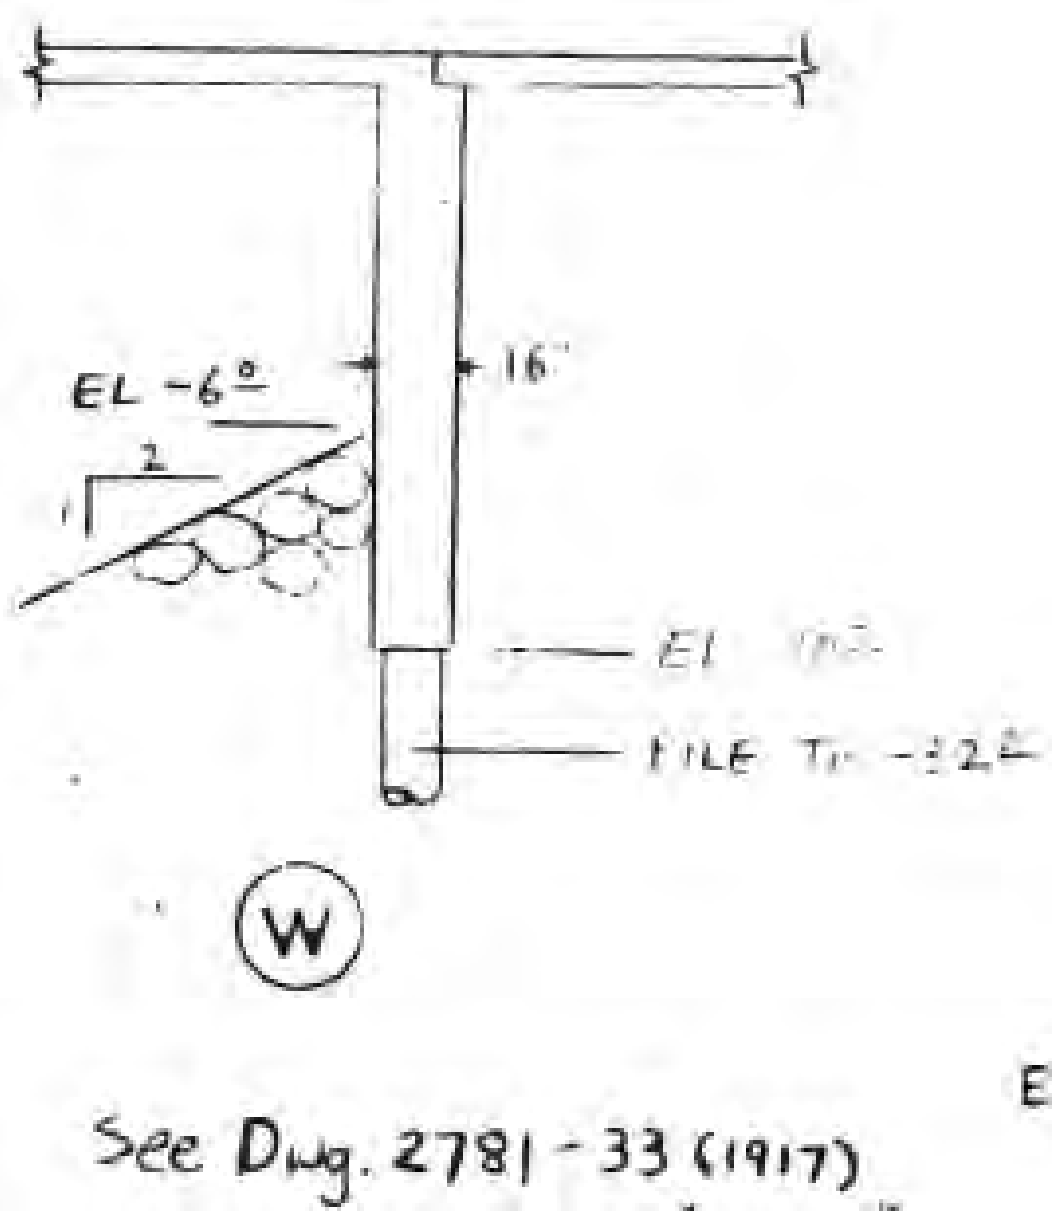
Seawall Sections 6 and 7: Seawall Type W
